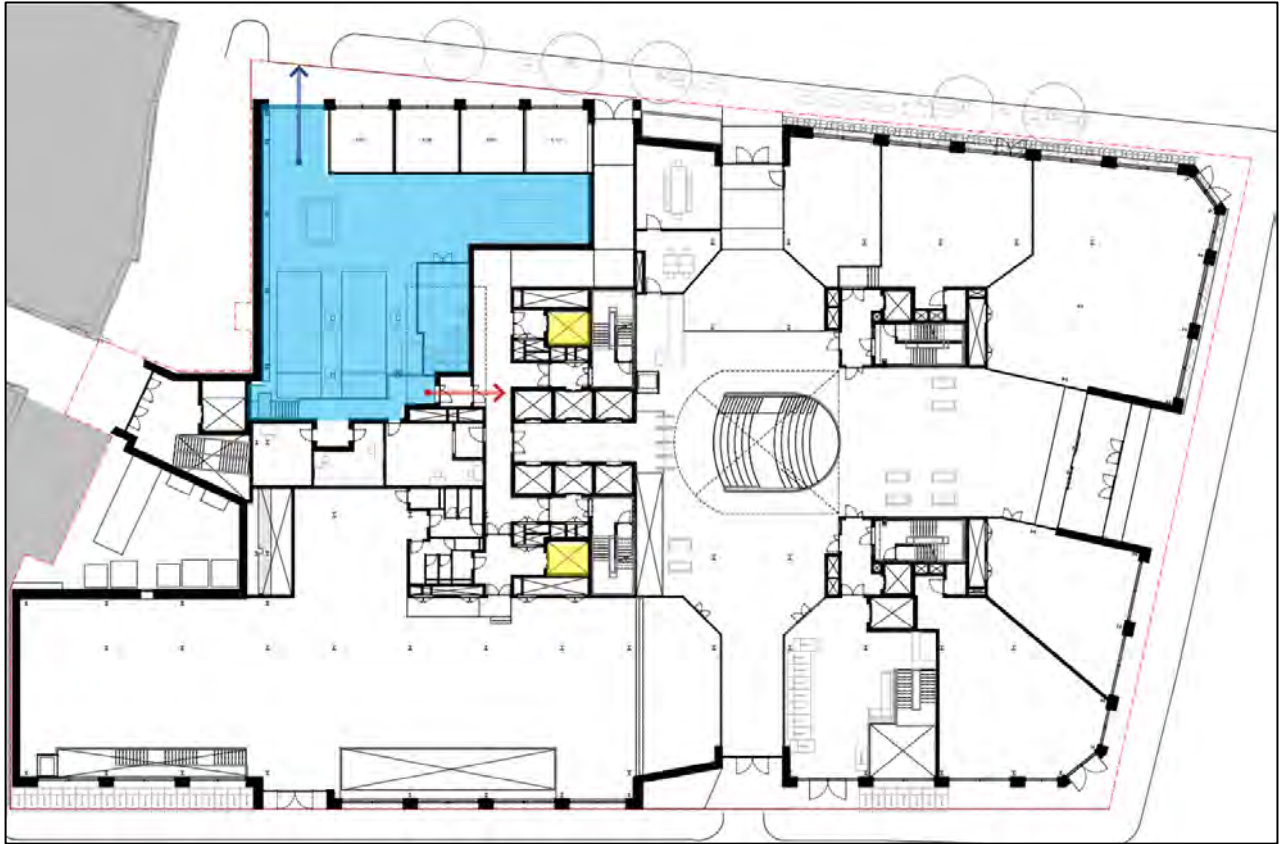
The proposed dedicated internal servicing yard (highlighted in blue) at ground floor level
